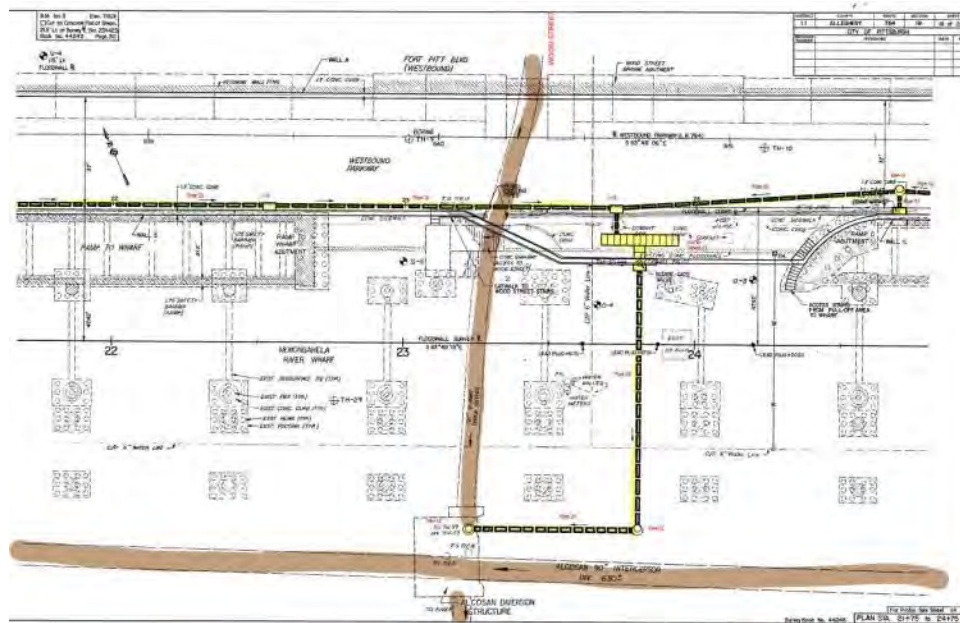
Sample Floodwall Drawing for the Big Bathtub Area (Near Wood Street) Showing the Big Bathtub Sump
